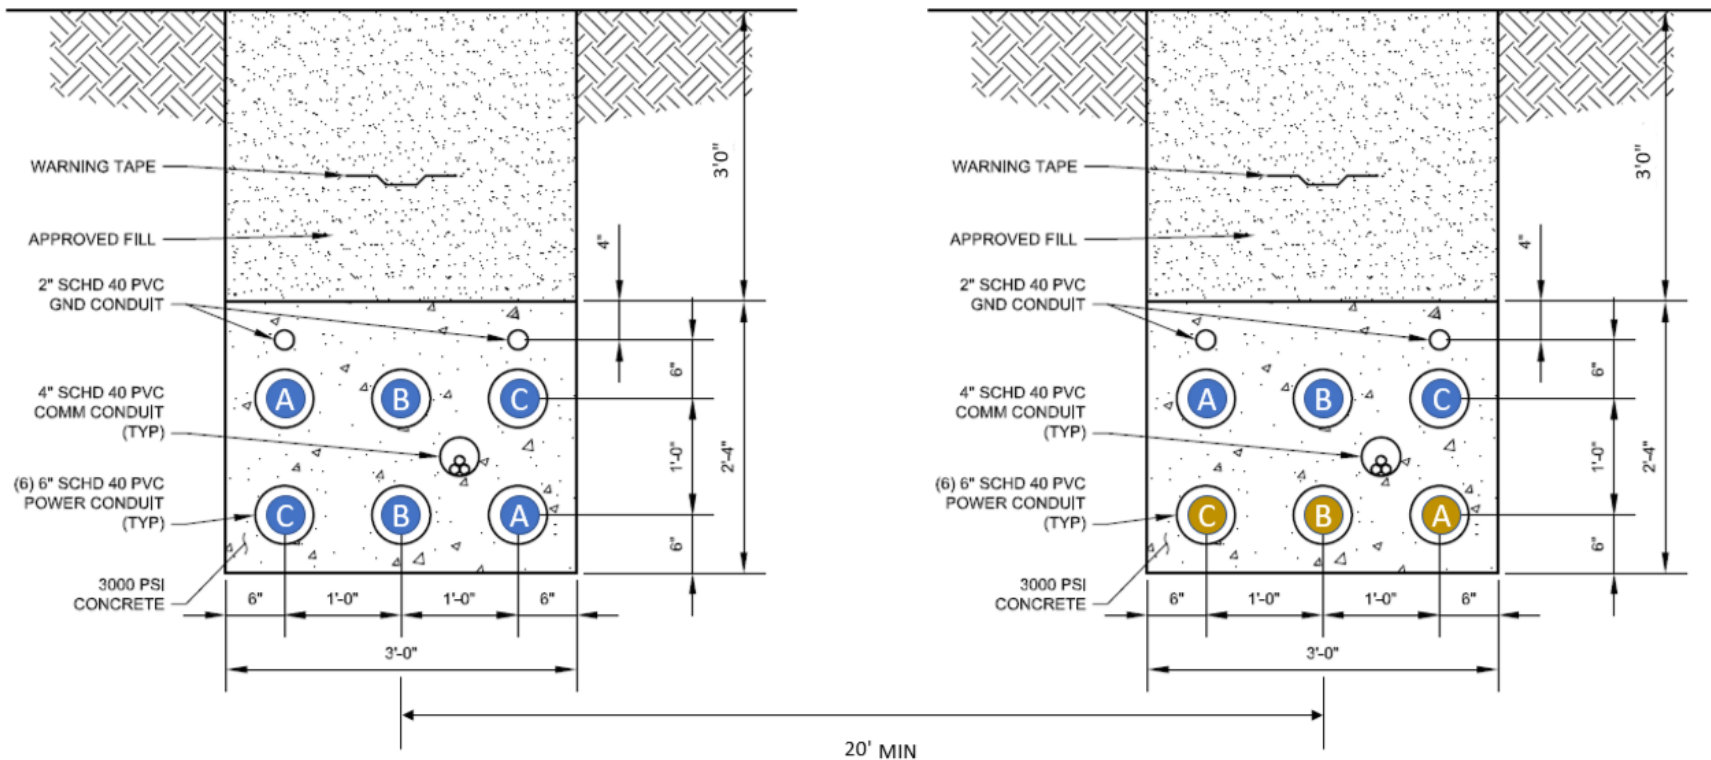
Representative cross-section of the Onshore Export Cables in two underground duct banks before the Project cables connect to the Indian River Bay Substation.
